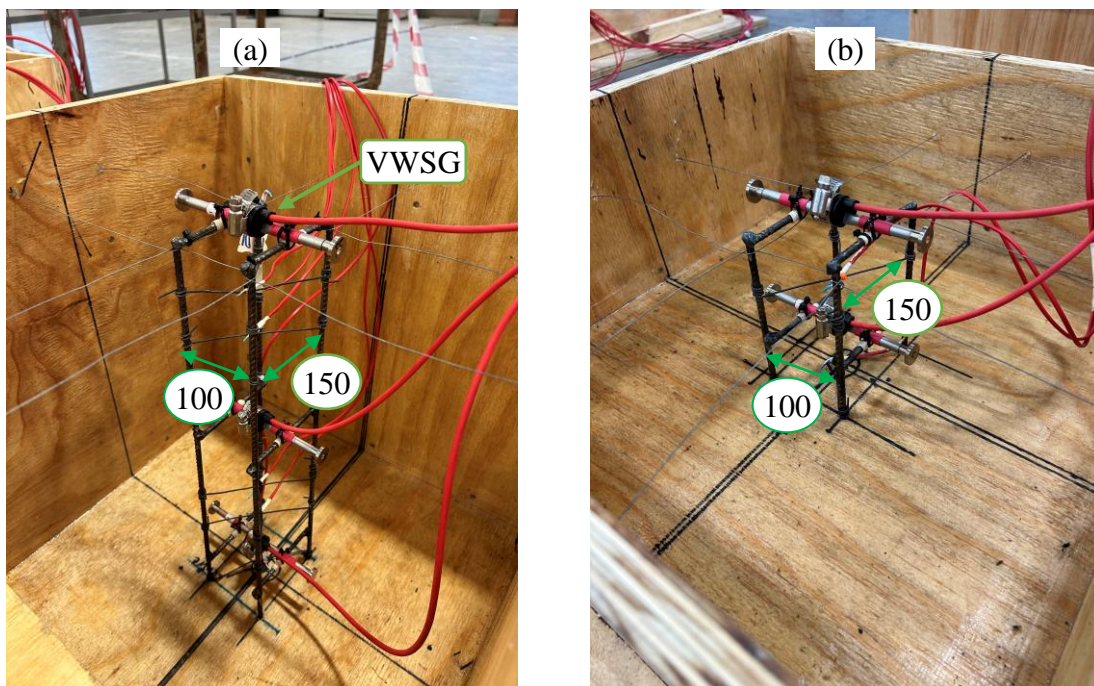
Steel cage and sensor layout within (a) Cube and (b) Flange moulds.
